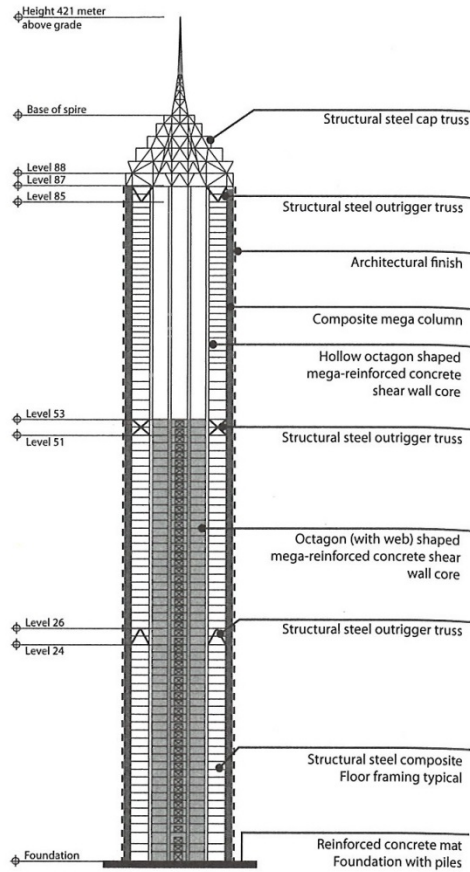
Jin Mao Tower - structural system elevation view (Choi et al. 2012)
